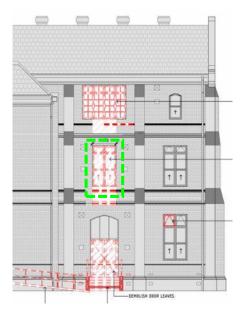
Extract of TP16 P2 E6, showing the extent of demolition of the South Wing at the north façade. A window on the first level is to be salvaged and reused (indicated in green). Source: Y2 Architecture, 2023.
